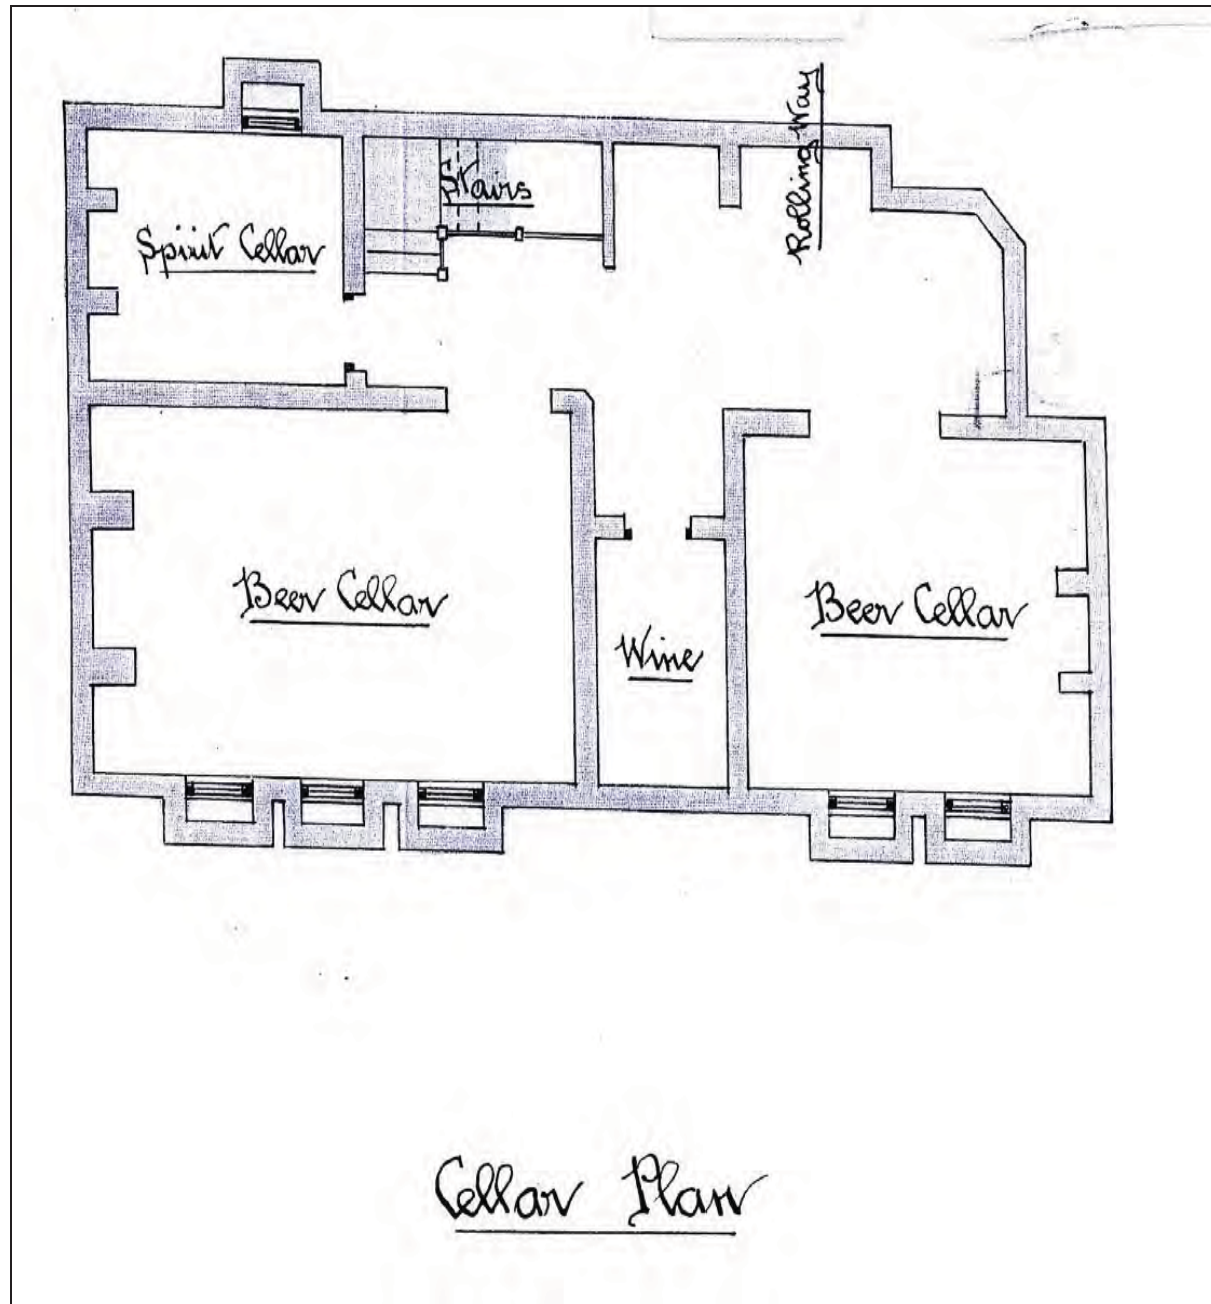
LBR Plan 3666 of 1896. No. 10 Northgate Street cellar plan, not shown to scale.
